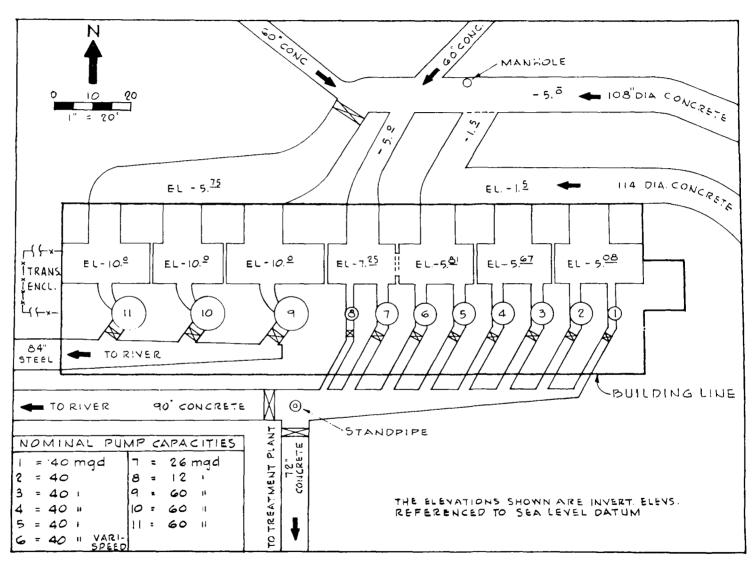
SCHEMATIC PLAN - SUMP NO. 2
